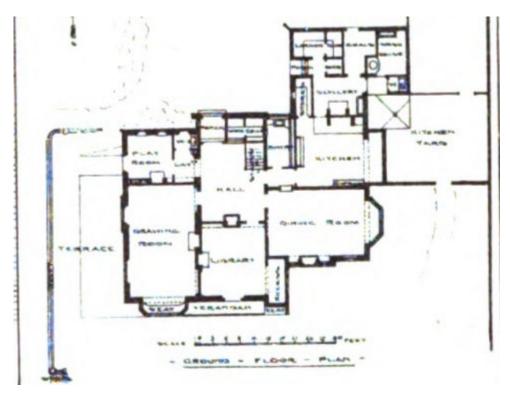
Enlarged Ground Floor Plan from The Building News, 1882
